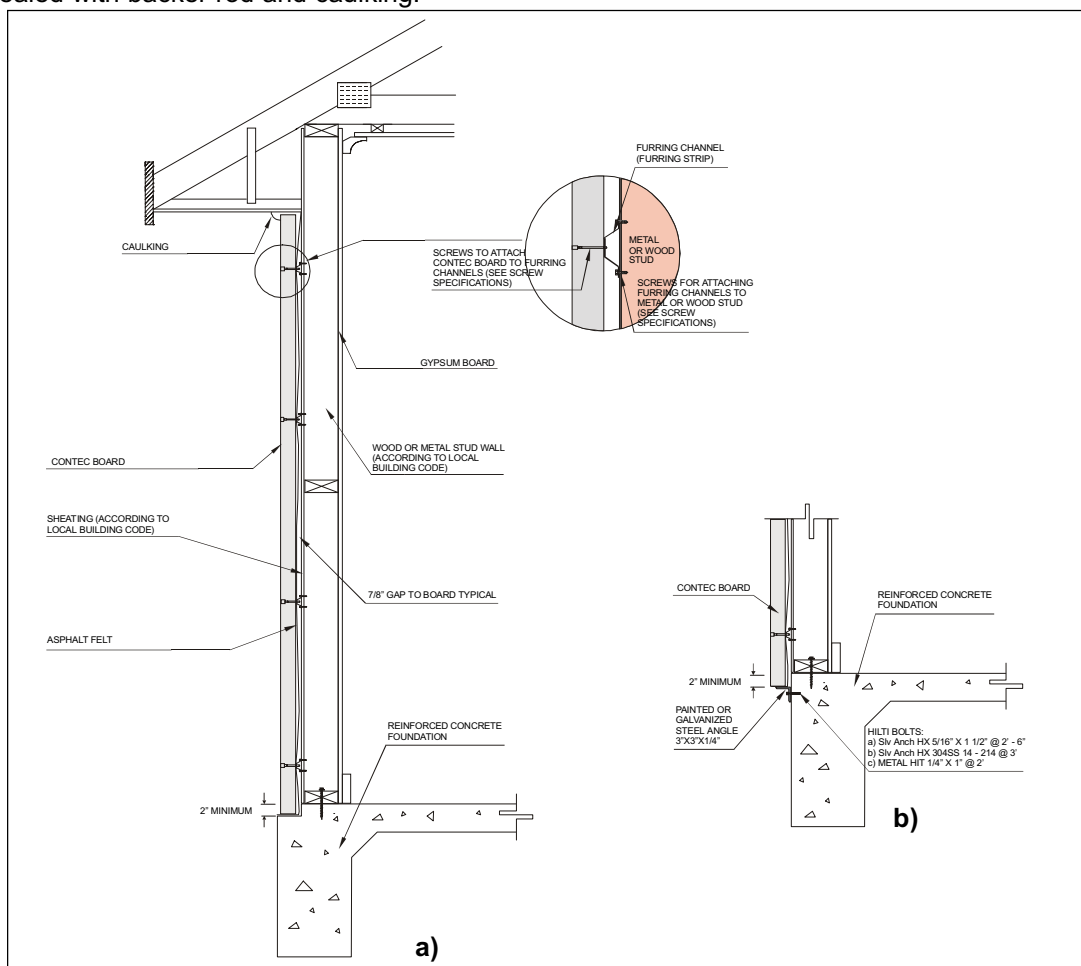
Typical cross section for a Contec Board construction. Foundation with: a) Brick ledge, b) Painted or galvanized angle.
